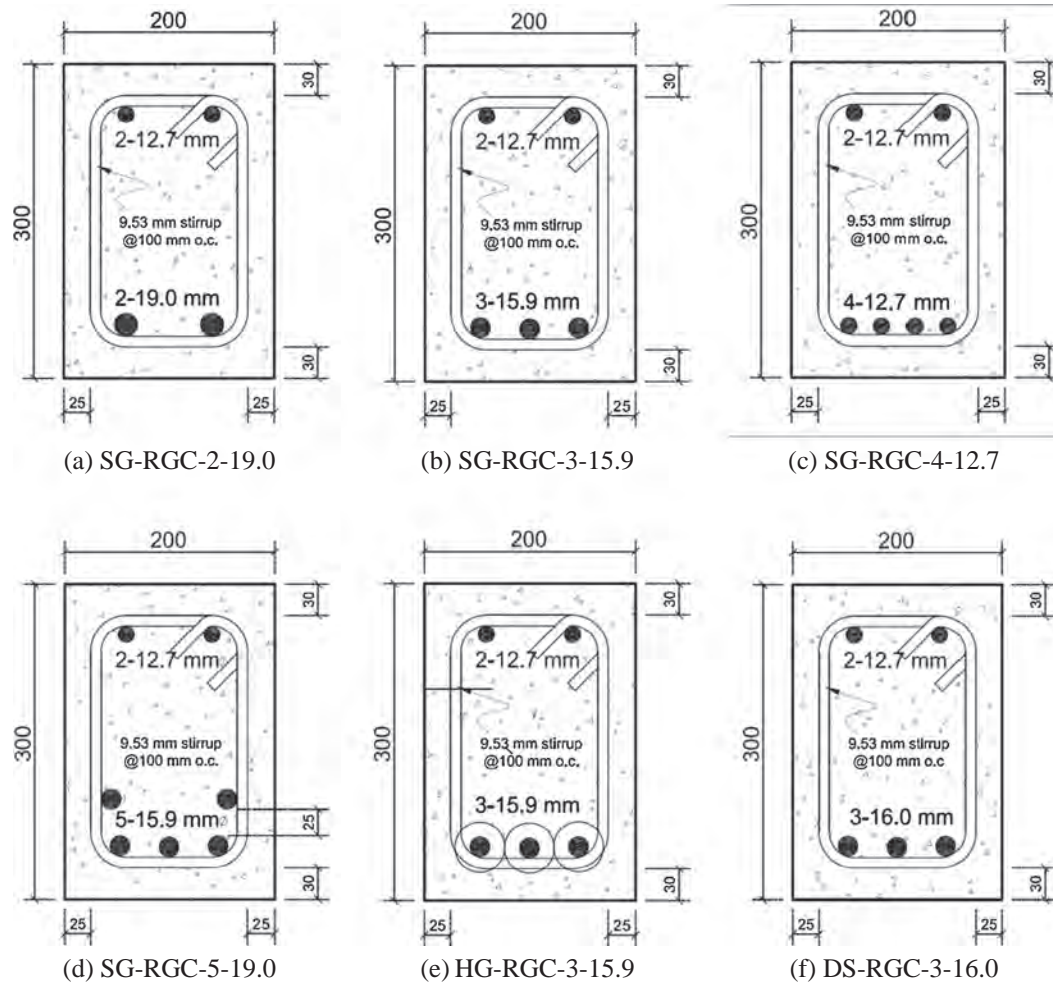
Geometry and reinforcement details of the tested beams (dimensions are in mm).
